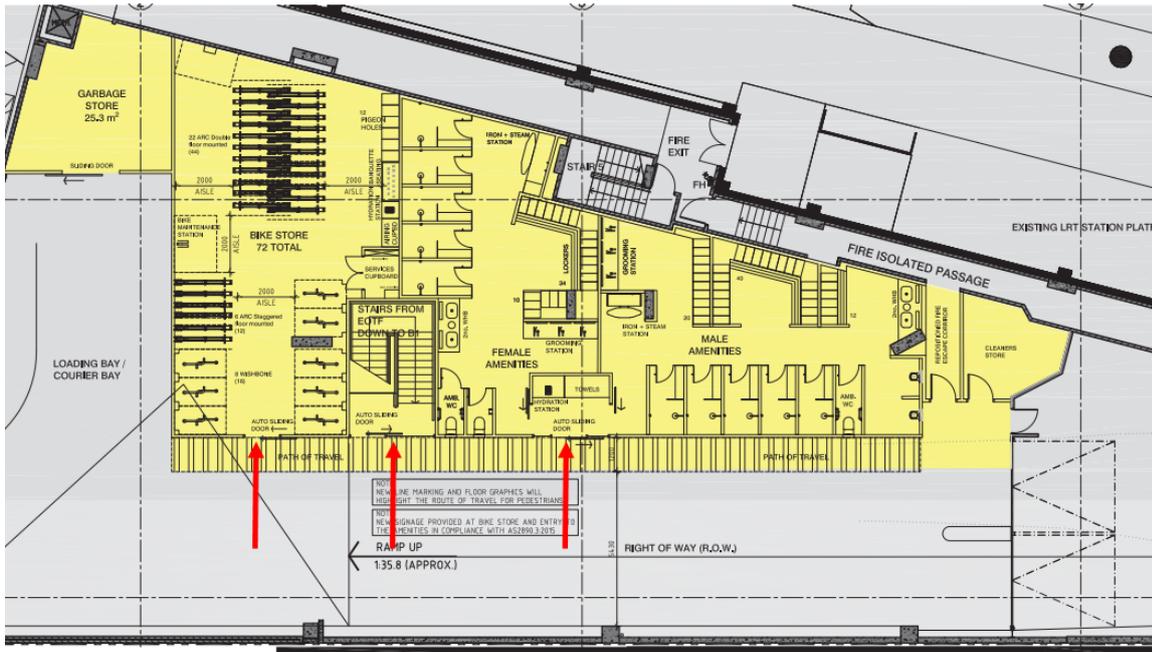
Plans lodged with the application show that users of the end of journey facilities were required to use the shared driveway for multiple pedestrian movements, between the bike store, showers and internal stairs that provide access to the offices above (red arrows).
